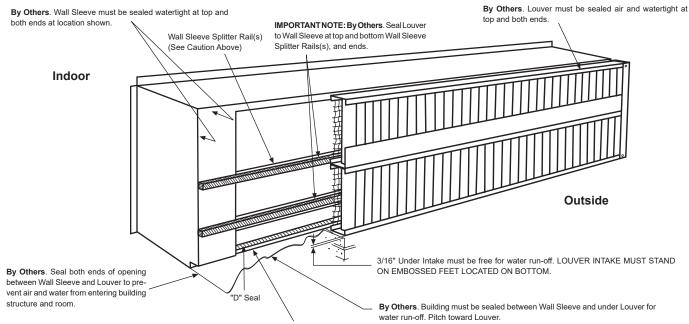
Recessed wall sleeve – mounting and sealing splitters to wall sleeve and louver
